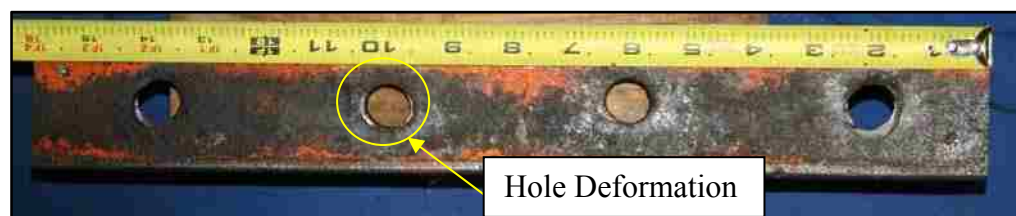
Buckling in West Angle Riveted Surface - Specimen 2R (4L)
